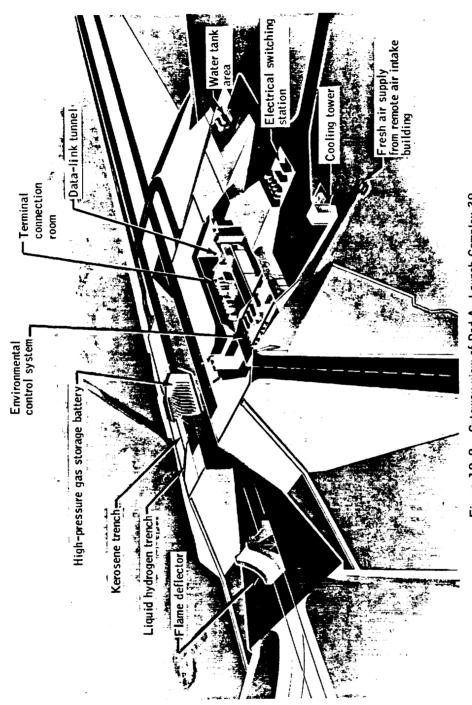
Cutaway view of Pad A, Launch Complex 39.
